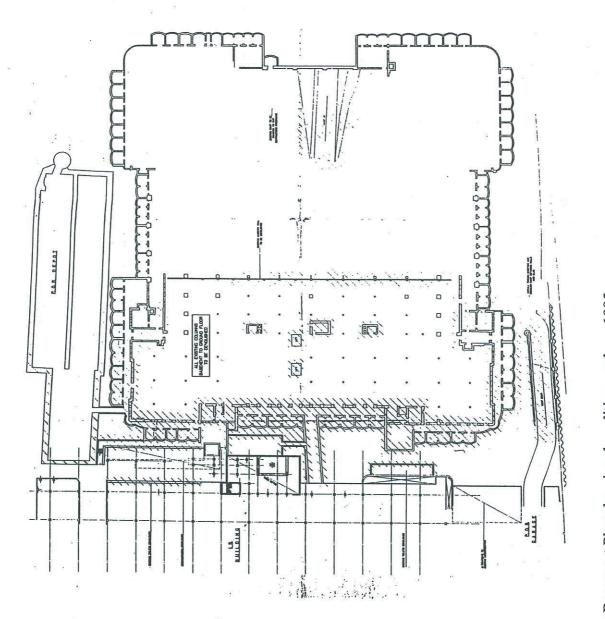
Parcel Office Basement Plan showing demolition works, c 1985
